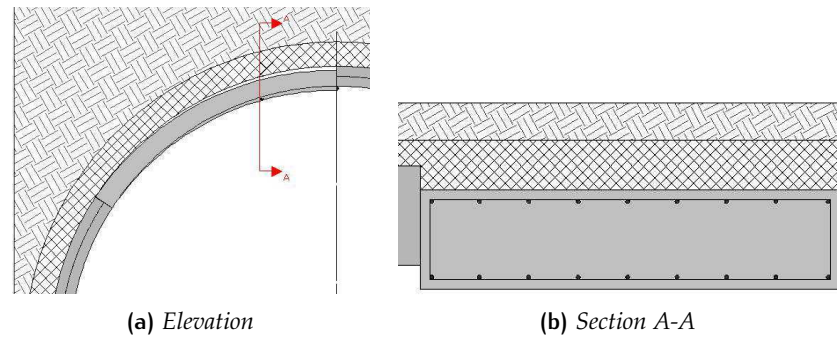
Section of the tunnel with the observed manufacturing defect
